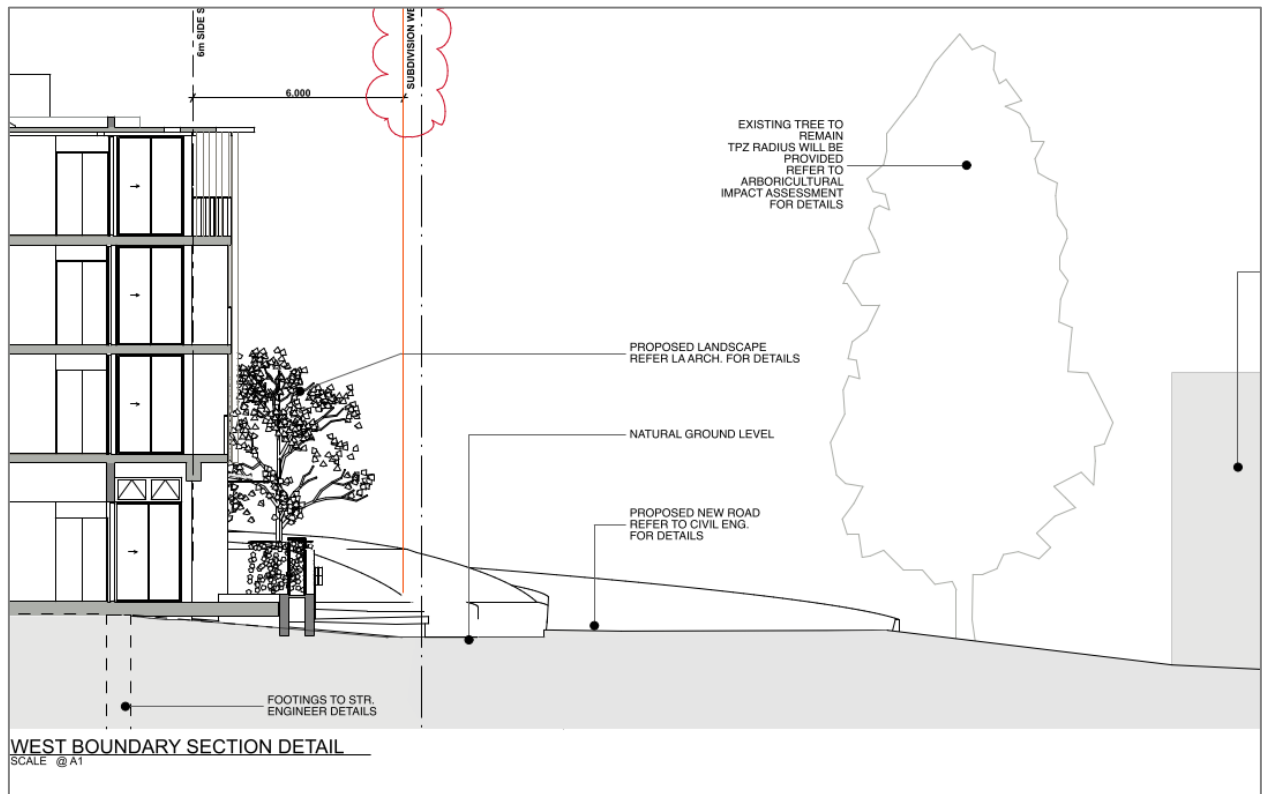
Western boundary detail – Building A interface with 11 Jennie Cox Close
